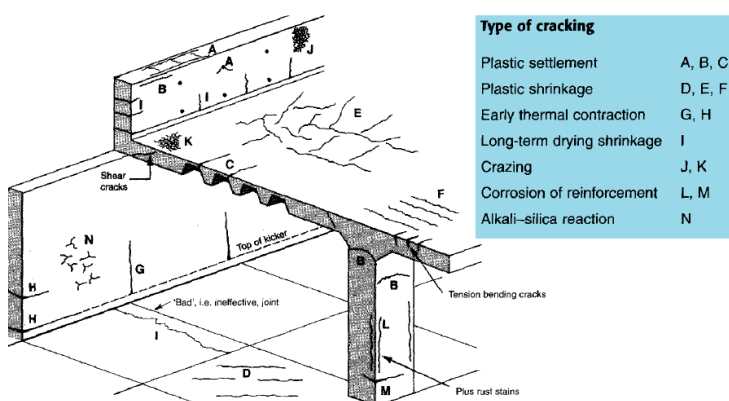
Examples of non structural cracks in concrete (The concrete society, 1982)
